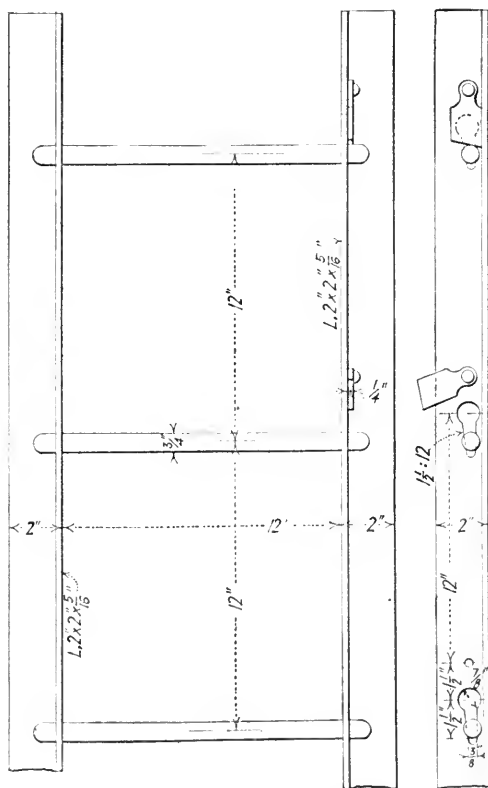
LADDER OF ANGLES WITH REMOVABLE RUNGS.
